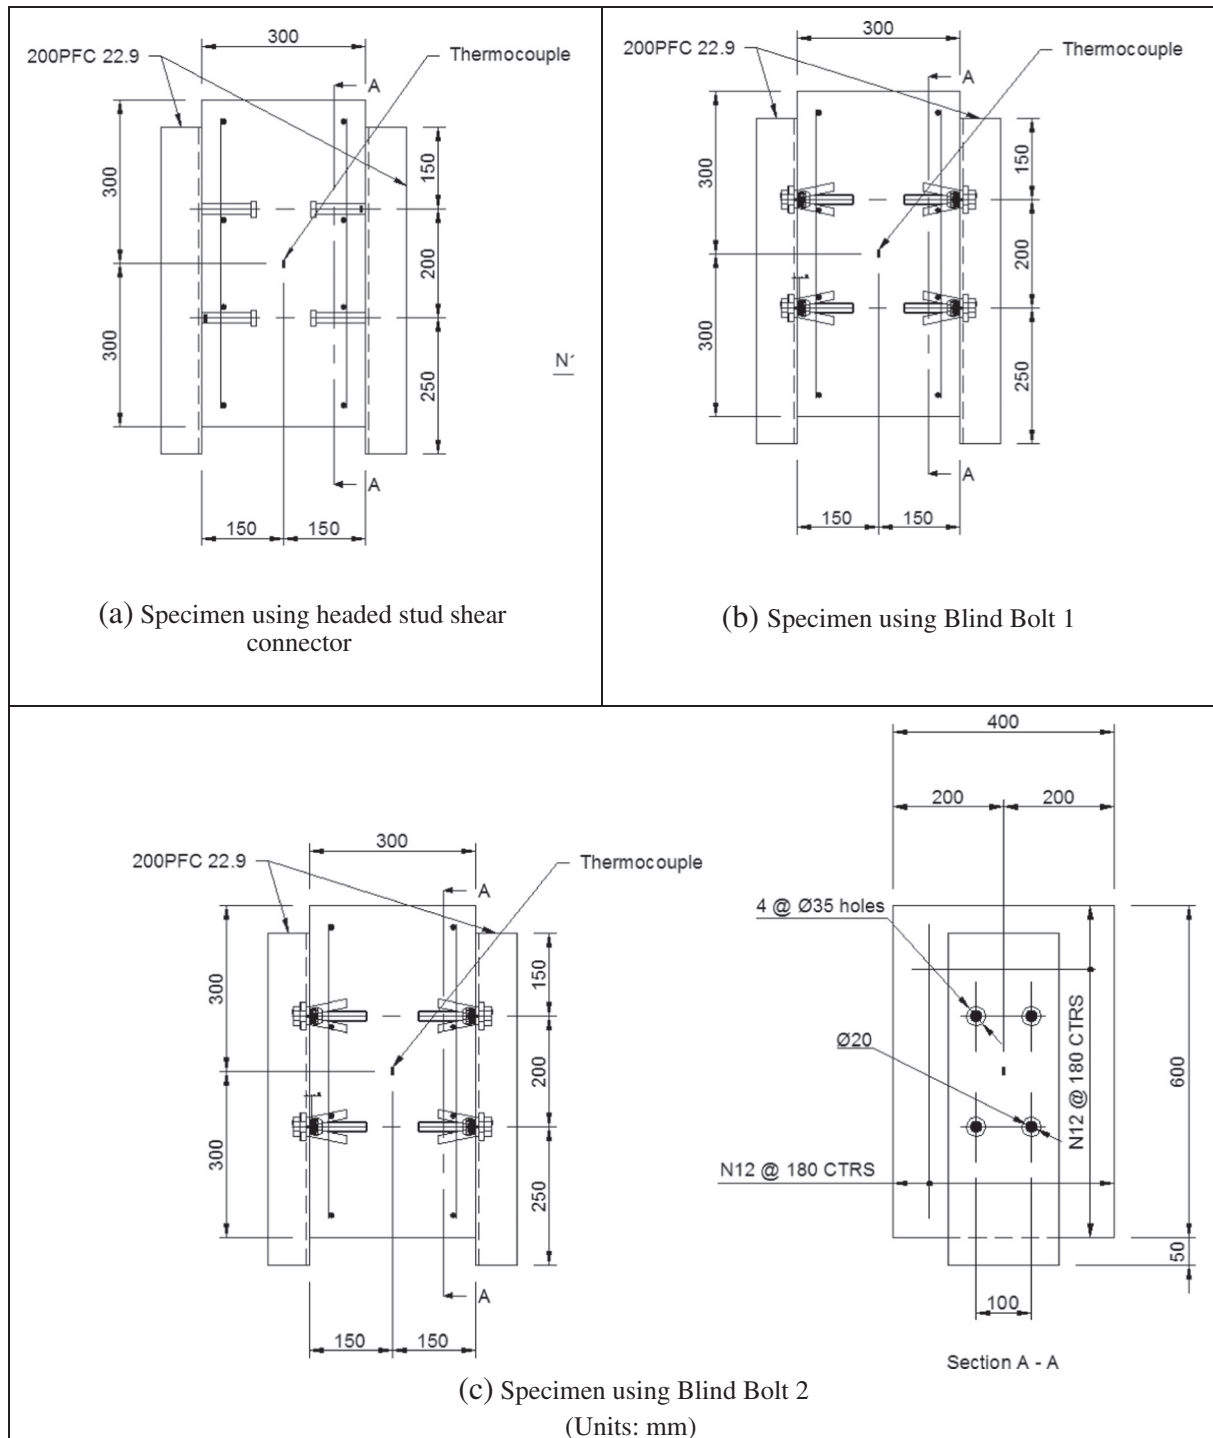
Push-out test specimens using (a) headed stud shear connectors, (b) Blind Bolt 1 and (c) Blind Bolt 2.
